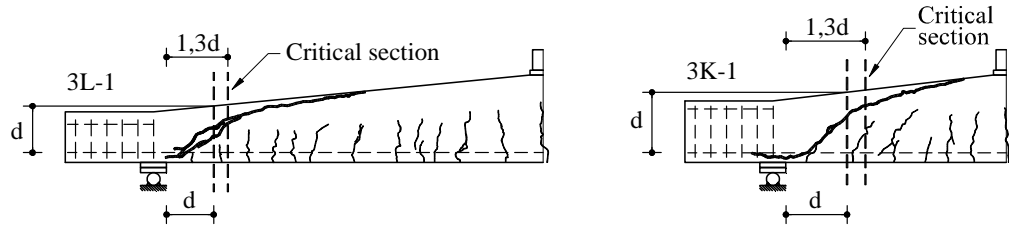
Assumed critical section and cracks of test beams 3L-1 and 3K-1
